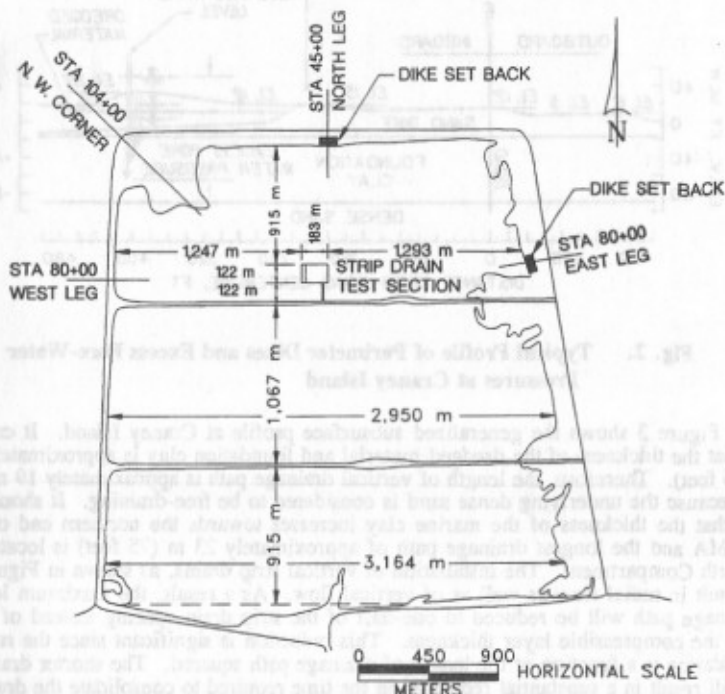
Plan View of Craney Island and Location of Vertical Strip Drain Test Section
